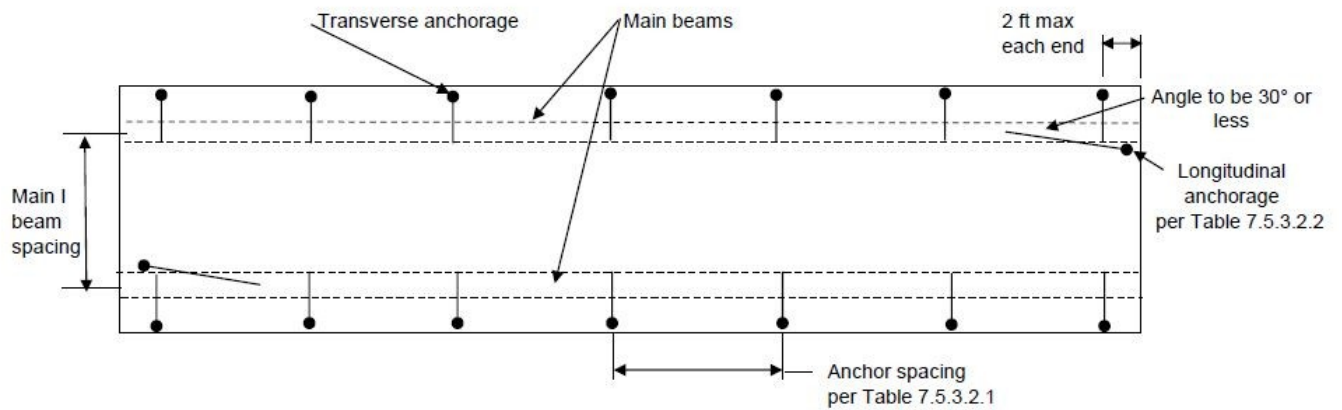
(b) Anchor Position Using Diagonal Straps
